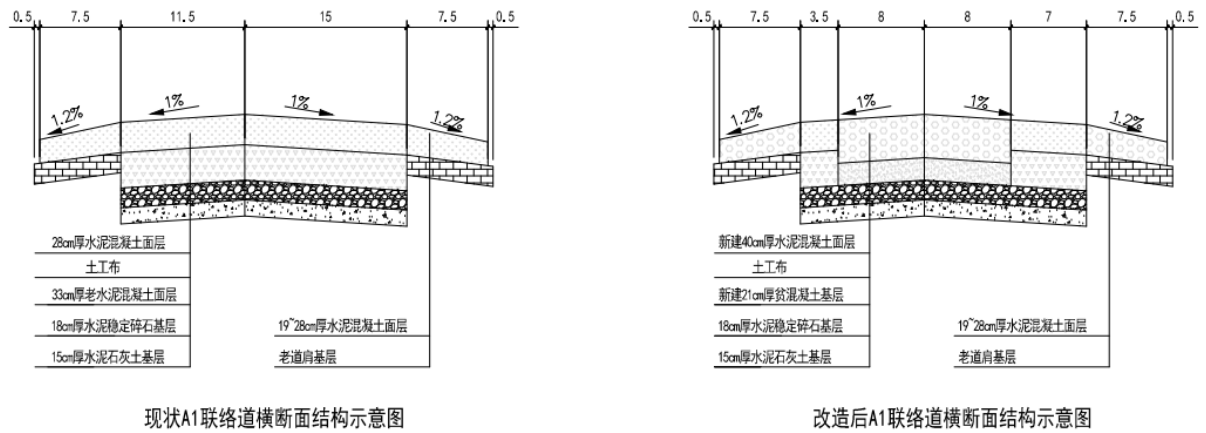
Cross section structure of A1 connecting road before and after reconstruction
